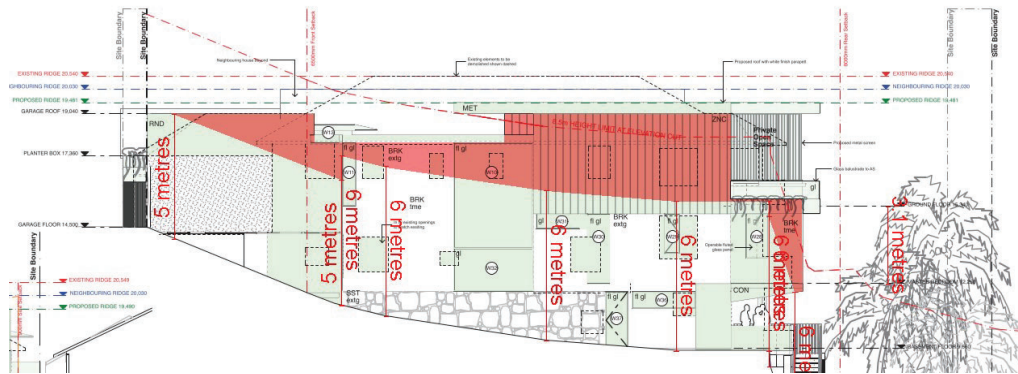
Extract from the Western Elevation with side boundary envelope encroachment in red
